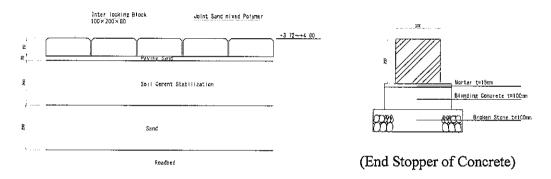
Cross Section of Interlocking Block Pavement
